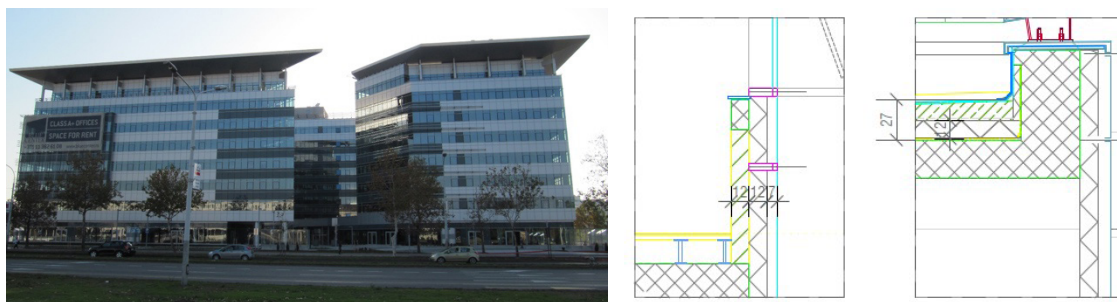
The Blue Centre office building in New Belgrade, Block 26 (source: *Energoprojekt archive*)
